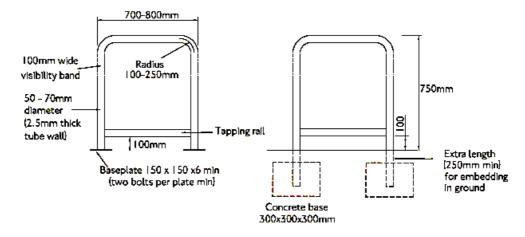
Sheffield Stand Plan and Elevation (TfL)
